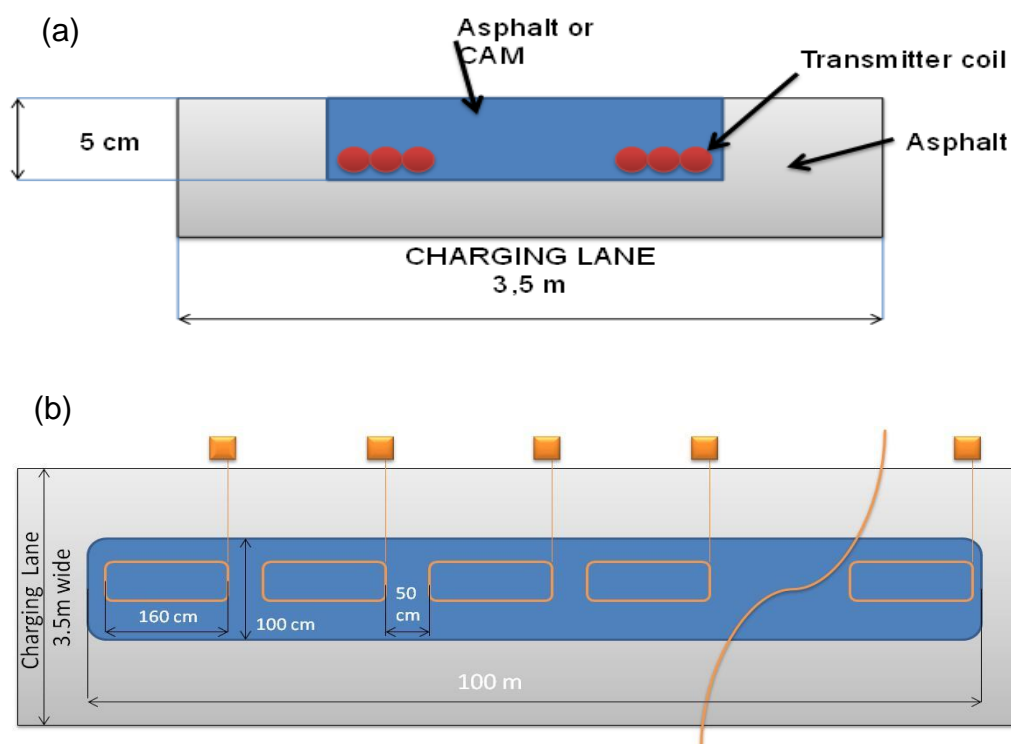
Example of cross section of a E-road lane ( 2D symmetric plane)
